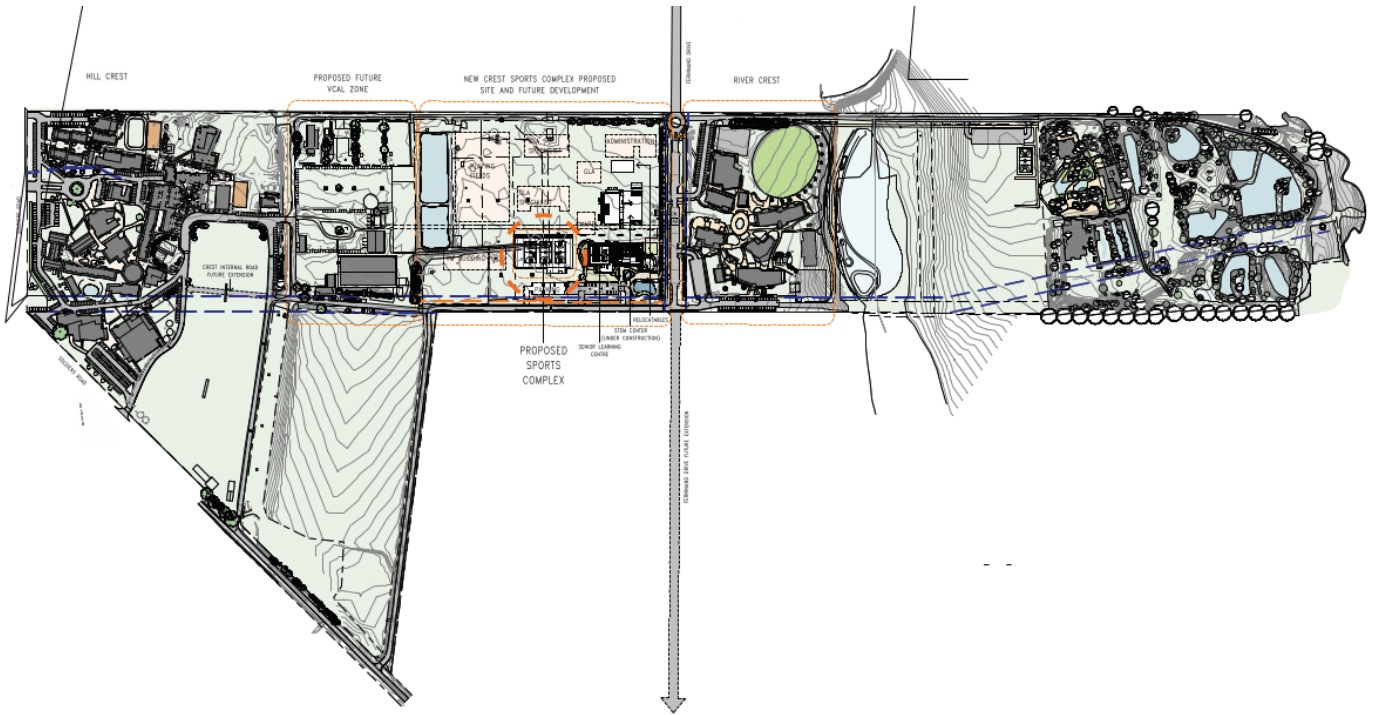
Location of works (shown in orange) on the site plan Master Plan?
